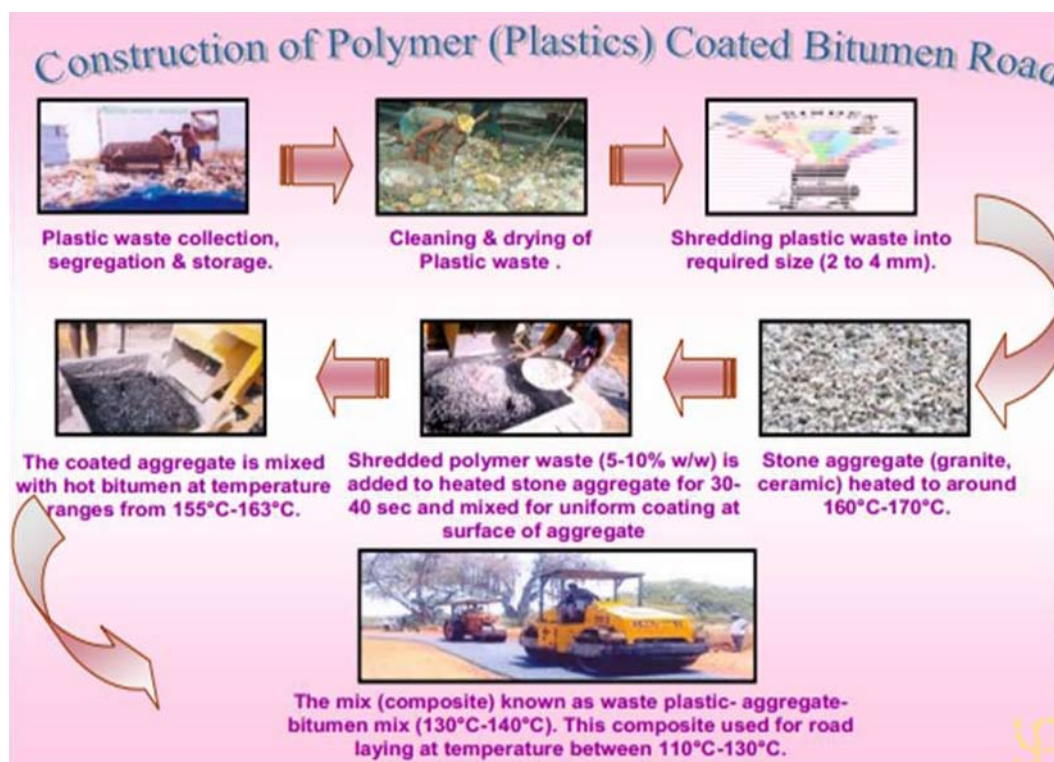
Use of Plastic Waste in Construction of Bituminous Road
